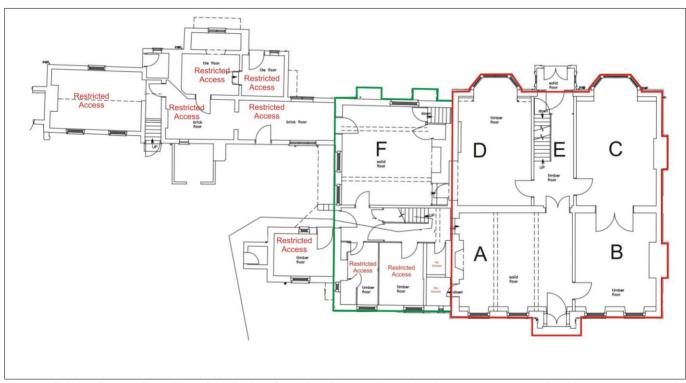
Existing Ground Floor Plan of the Project Site. Main Block outlined in red, main extension outlined in green. Lettering is to aid interpretation of the following description.
